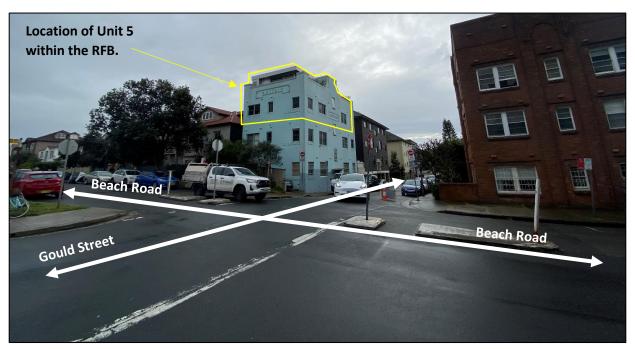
Subject unit as viewed from the corner of Beach Road and Gould Street, looking north.
